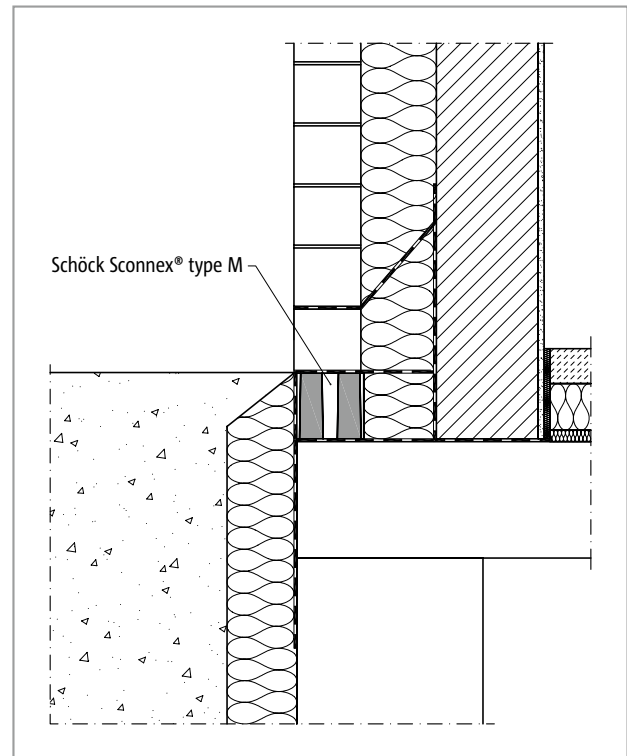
Schöck Sconnex® type M: Connection with double-leaf masonry
